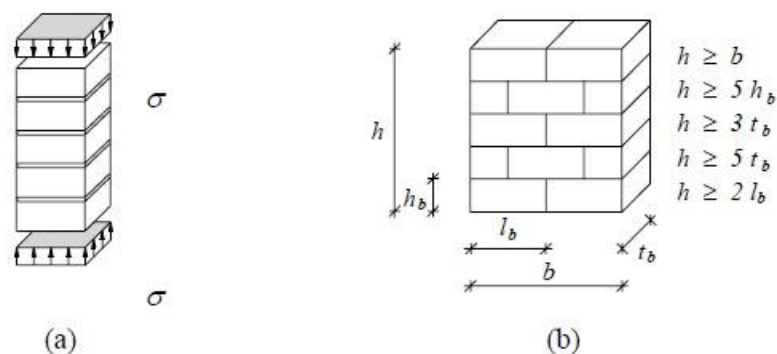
Uniaxial Compressive Strength Test Specimens for Masonry: (a) Stacked bond prism; and (b) RILEM specimen [61]
